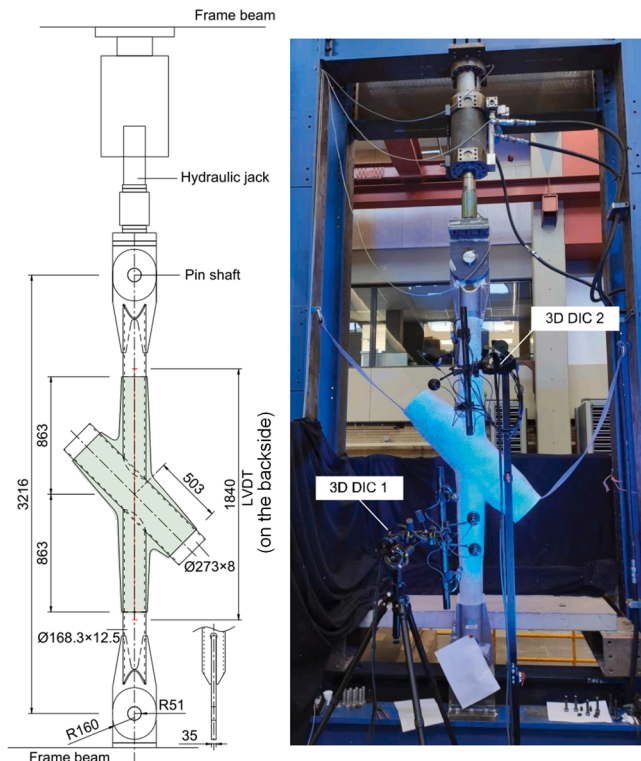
Specimen dimensions and test set-up of upscaled joints.
